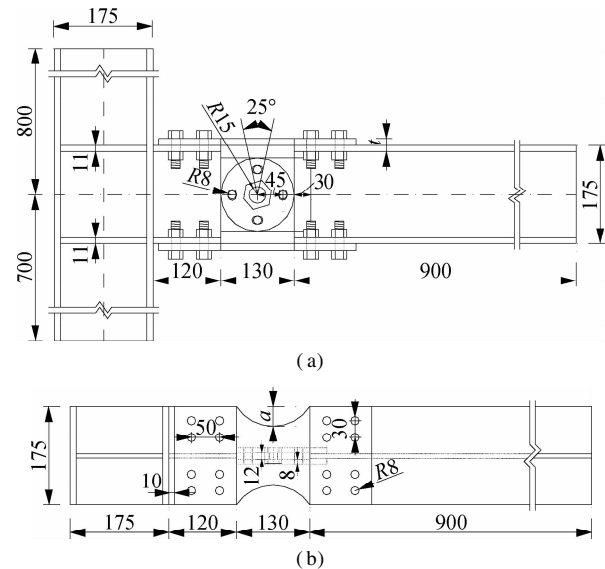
Detail of the joint dimensions (unit: mm). (a) Front view; (b) Top view
